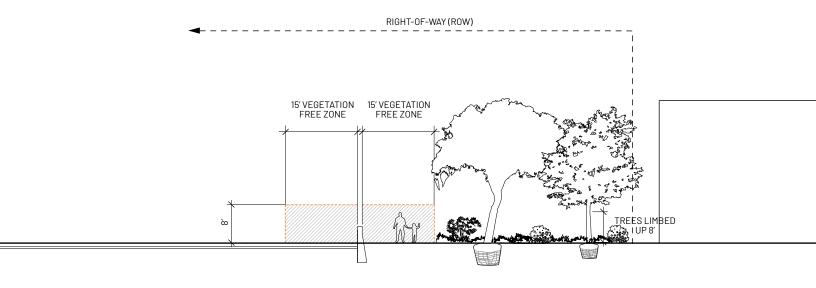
Planting along floodwalls is achievable as long as the vegetation-free is kept clear of shrubs and trees. Planting along floodwalls must follow the USACE requirements as stated in the Guidelines for Landscape Planting and Vegetation Management at Levees, Floodwalls, Embankment Dams, and Appurtenant Structures. Source: Drawing based on US Army Corps of Engineers Guidelines for Landscape Planting and Vegetation Management at Levees, Floodwalls, Embankment Dams, and Appurtenant Structures, 2014.
